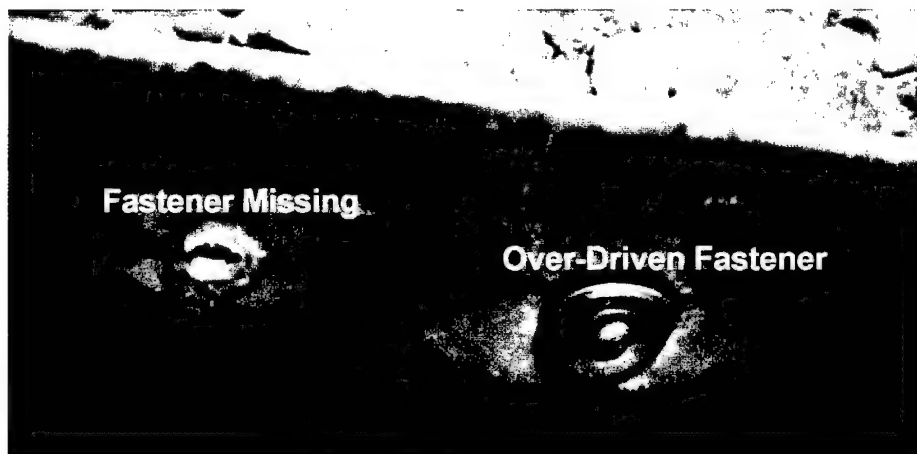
Effects of driving a fastener into a pocket of poor consolidation
